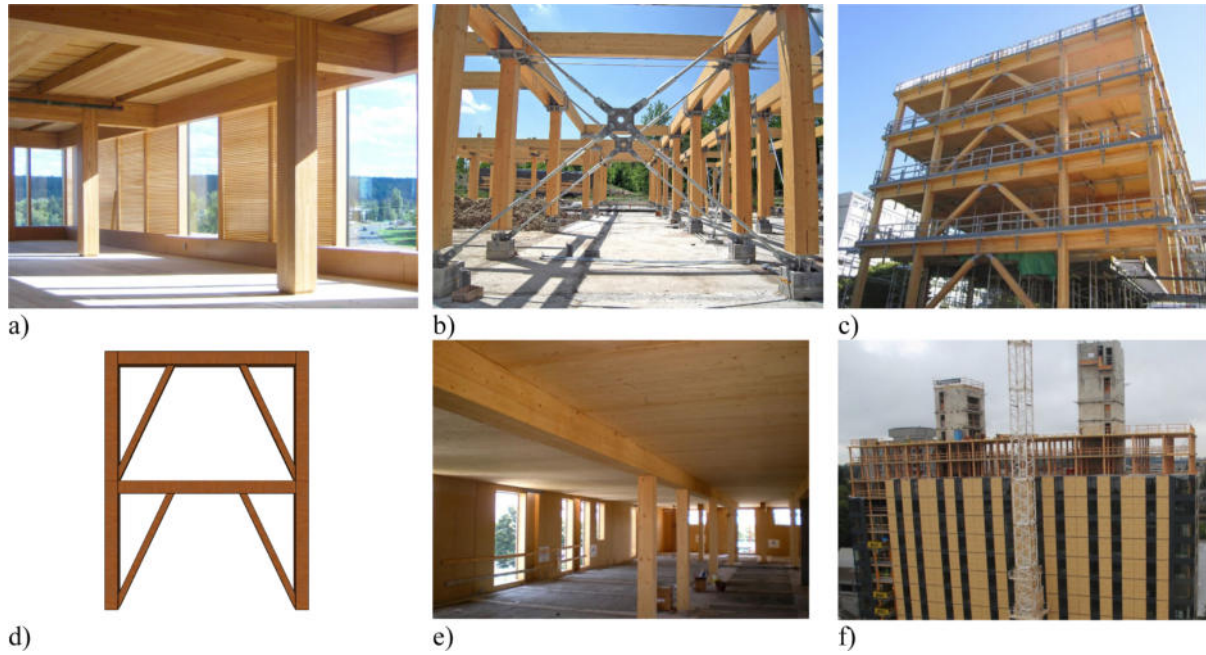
Heavy timber frame example: a) MRF (www.archdaily.com.br); b) CBF-X (www.teknoring.com), c) CBF-V (www.studiokamyk.com.pl); d) EBF; e) MRF with CLT floors (www.prefabbricatisulweb.it); f) Timber frame with reinforced concrete core (www.firegroundleadership.com).
